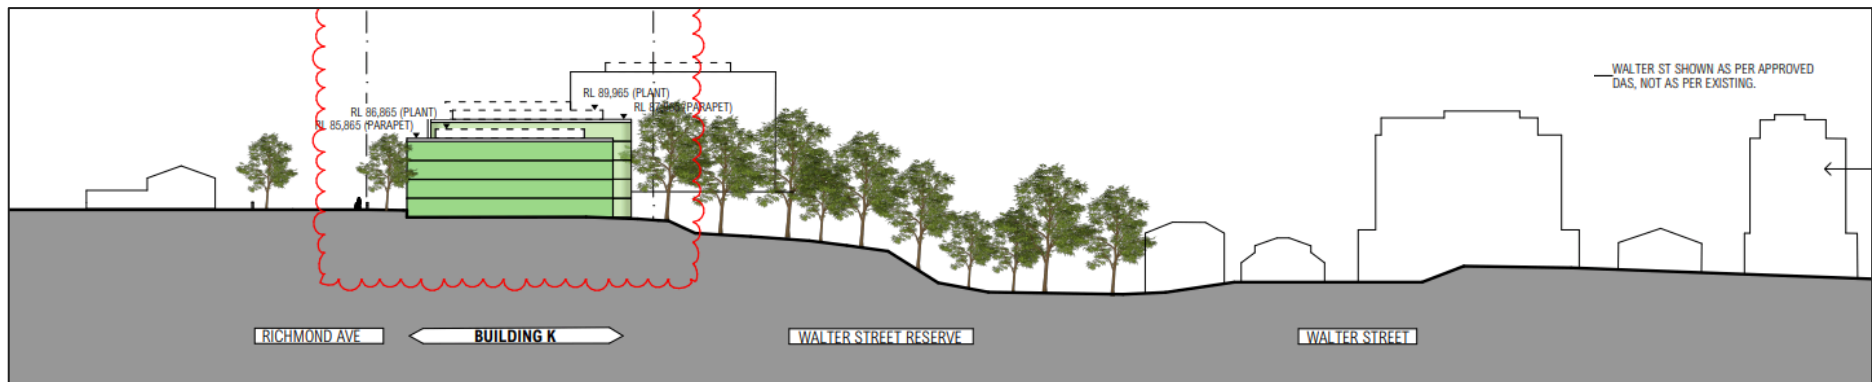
| Southern Elevation (note: envelopes were subsequently amended and parapets reduced by 1.2m (Source: RTS))
